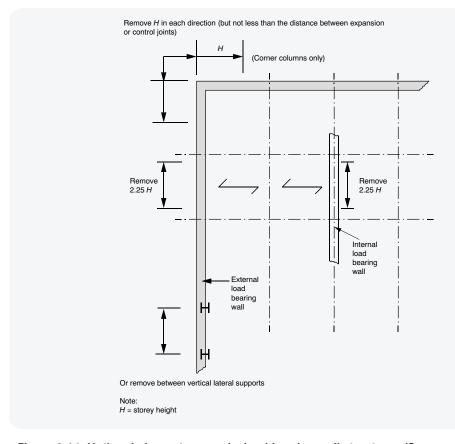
Notional element removal – load-bearing wall structures (Source: IStructE (2010)).
